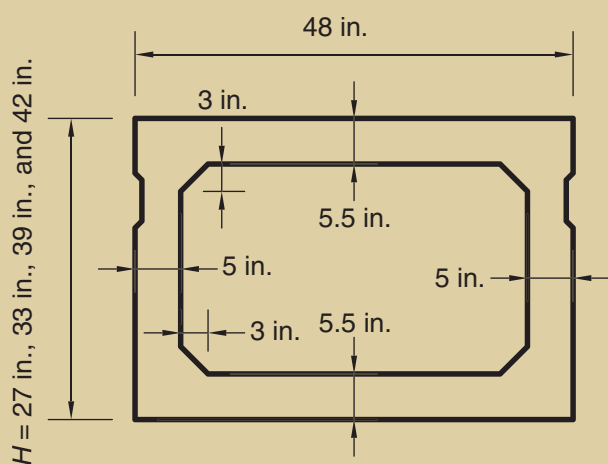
This drawing shows the American Association of State Highway and Transportation Officials' standard box girder used for developing the design charts currently available in the PCI *Precast Prestressed Concrete Bridge Design Manual*. Note: H = height of box girder. 1 in. = 25.4 mm.
